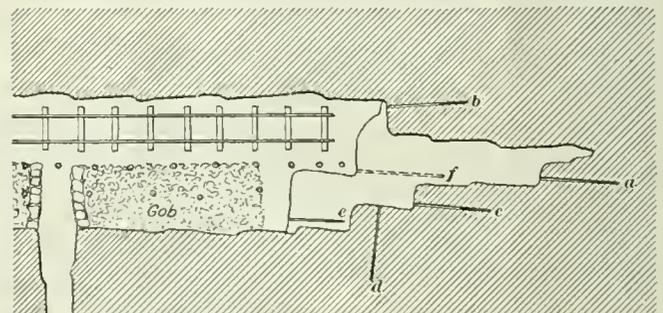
PLAN OF TRIPLE-BENCH ENTRY
